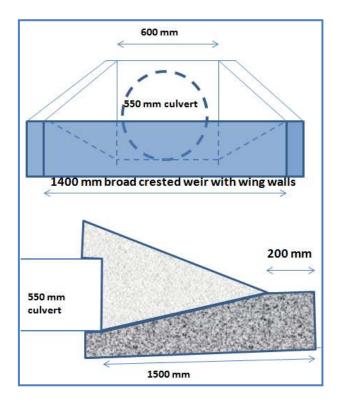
Schematic of weir and culvert structure on Jackfish Lake outlet channel.
